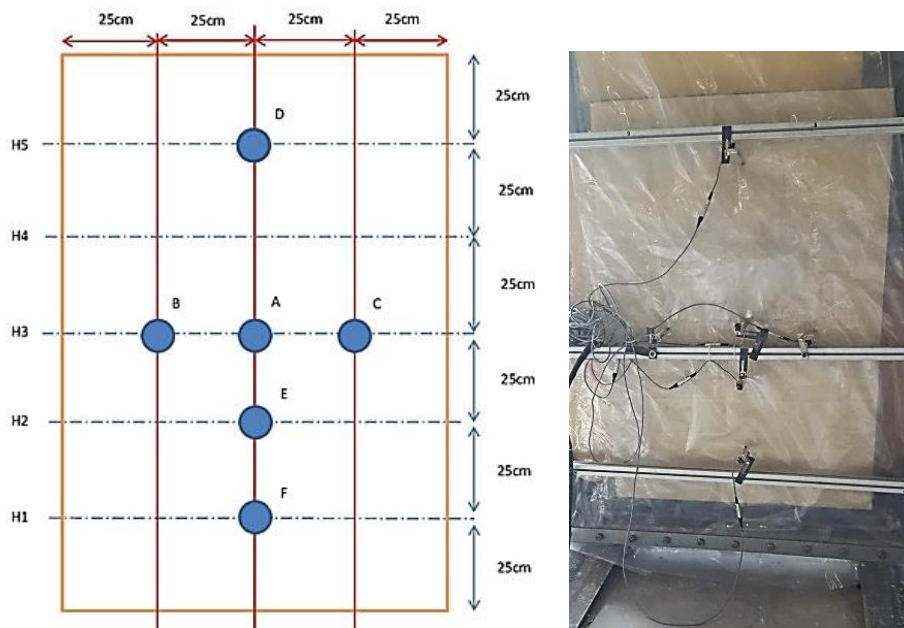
Arrangement of potentiometers on panels (for all tests)
